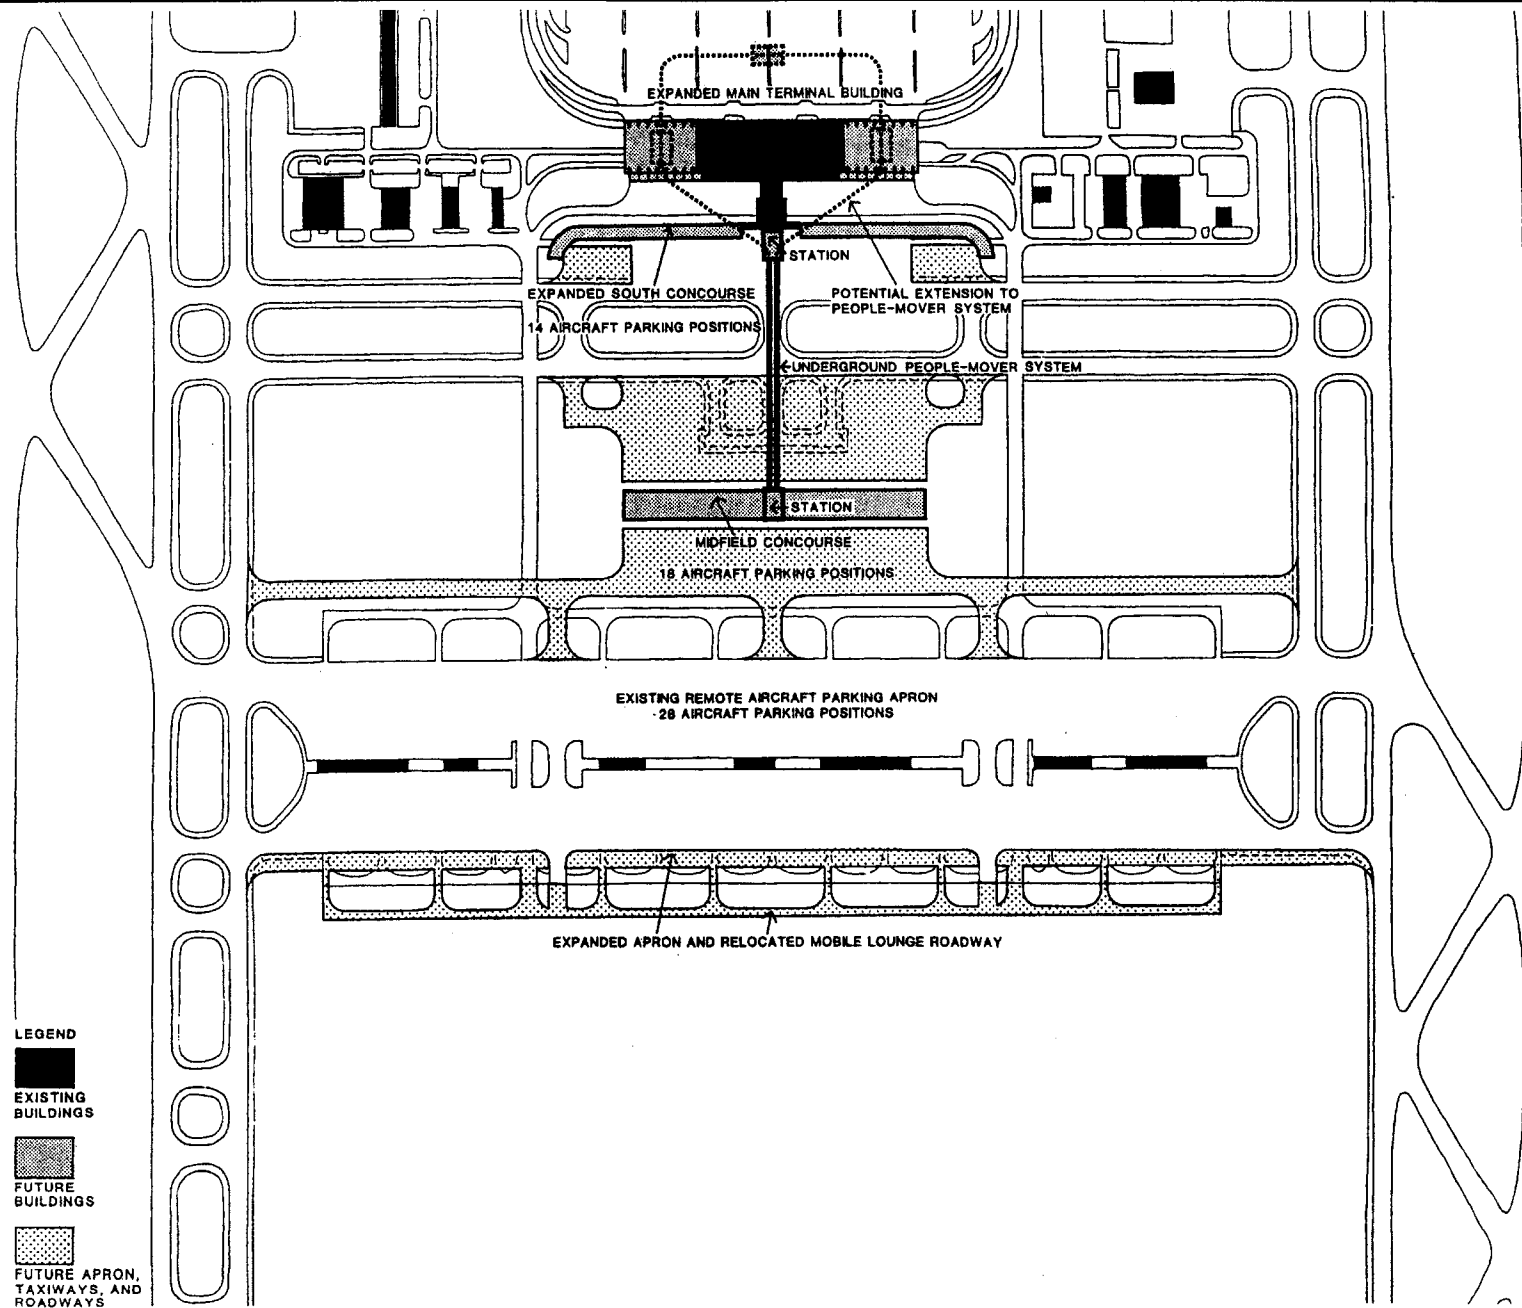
Washington Dulles International Airport Master Plan (1985): Terminal Concept C.
